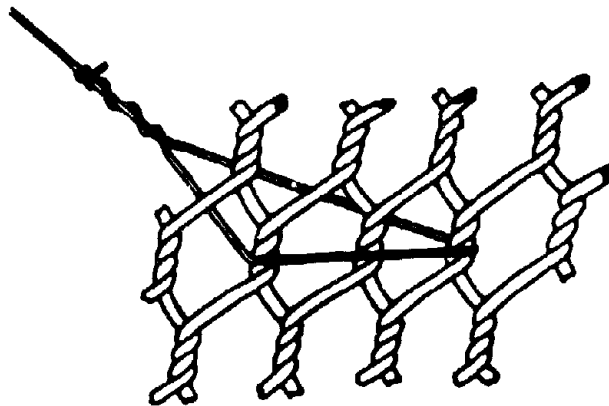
Detail of connecting wires between lifts.⁽¹⁾
